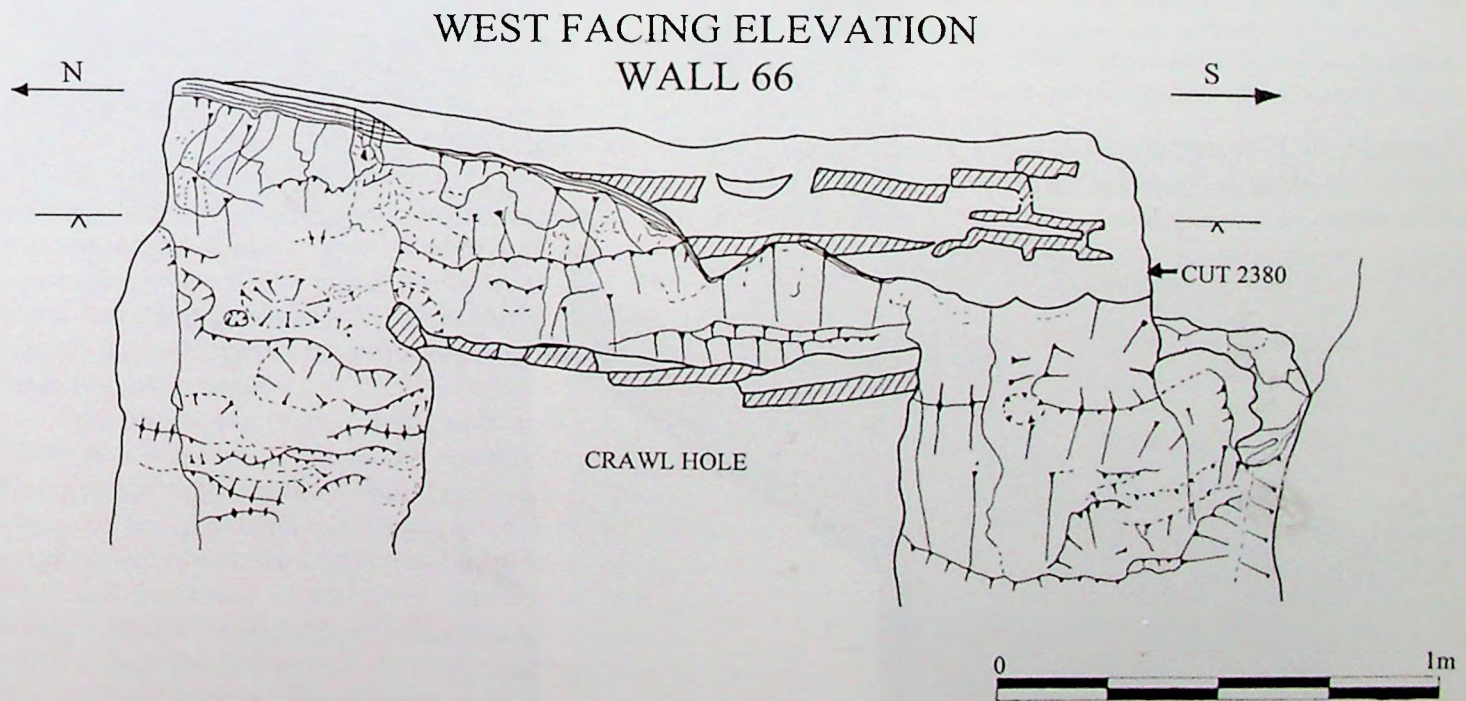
Drawing of Wall 66, Building 2, Space 117 rendered according to 'scientific' convention by John Swogger.
